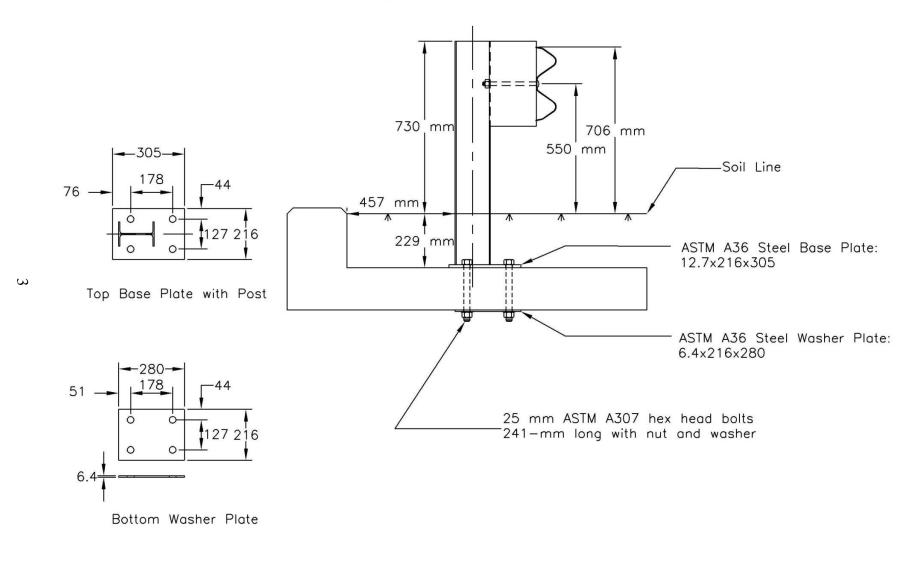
W-beam System Attached to Low-Fill Culverts Developed at MwRSF [2-4]
